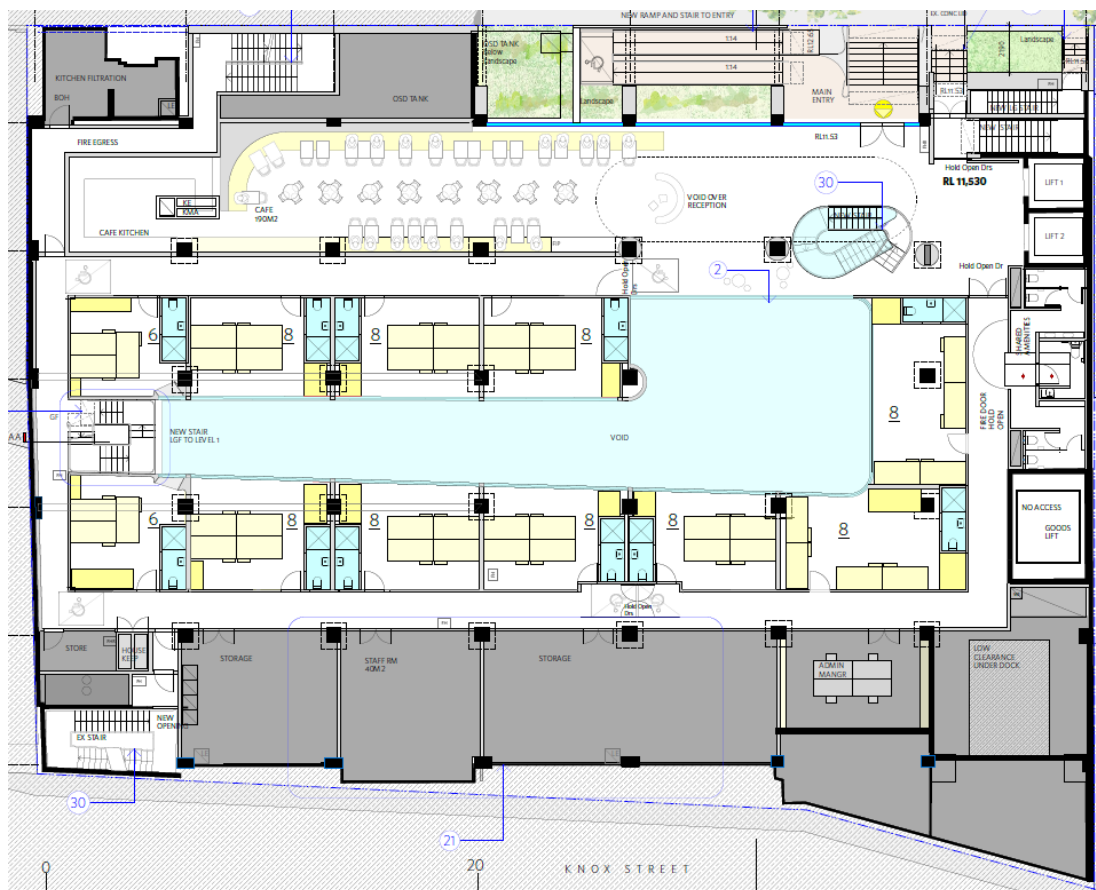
Ground-floor café layout plan (Durbach Block Jaggars)
